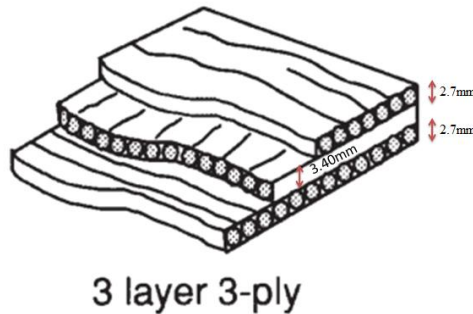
Details of the plywood used to reinforce holes in LVL beams
